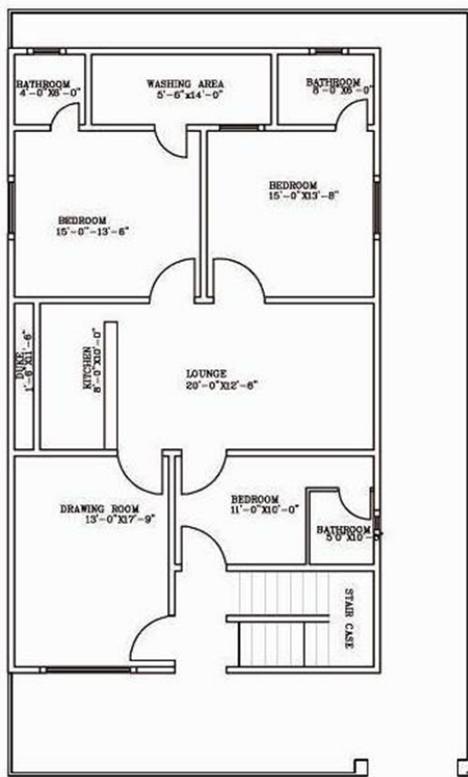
Typical 120 sq yards house plan - Gulberg Town, Karachi.
